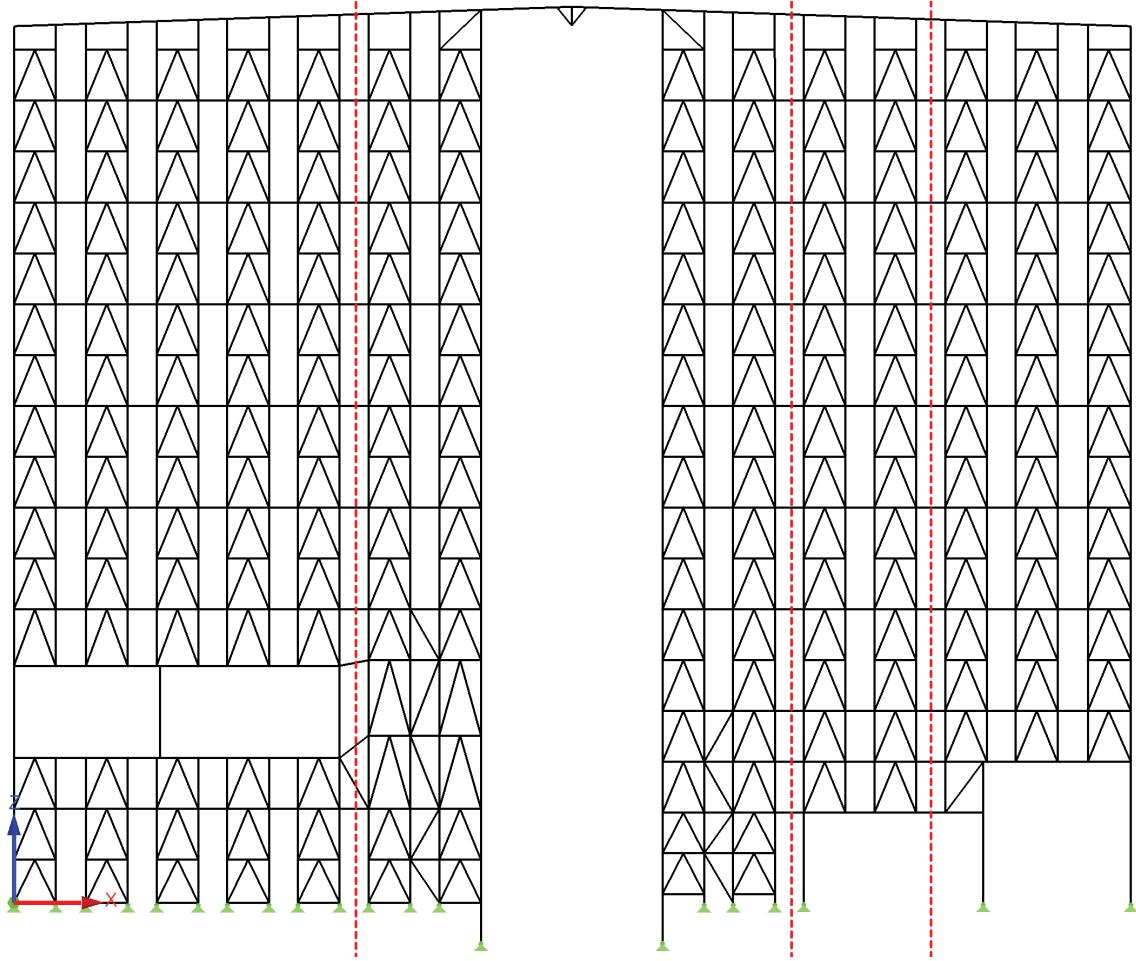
Short side of the warehouse. Red dash line divides building into blocks.
